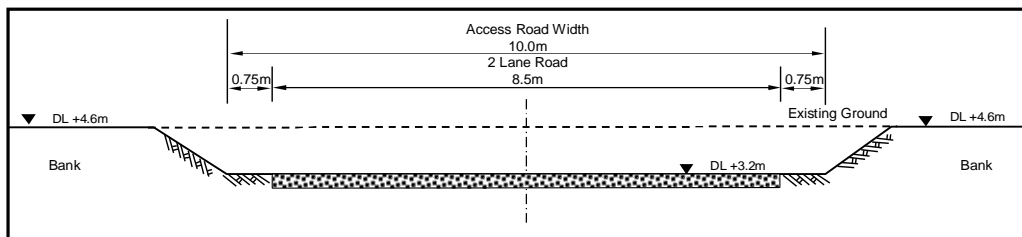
Cross Section of Bank Portion of North Access Road
